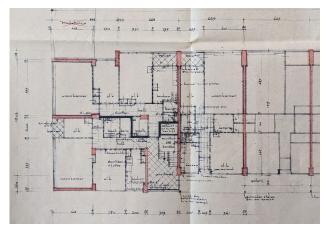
Block III: Floor +2 - Column and Loadbearing wall combination.
